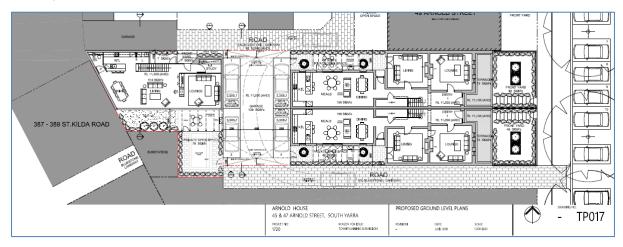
extract of the advertised site plan for TP-2018-790 (Source: Council)
